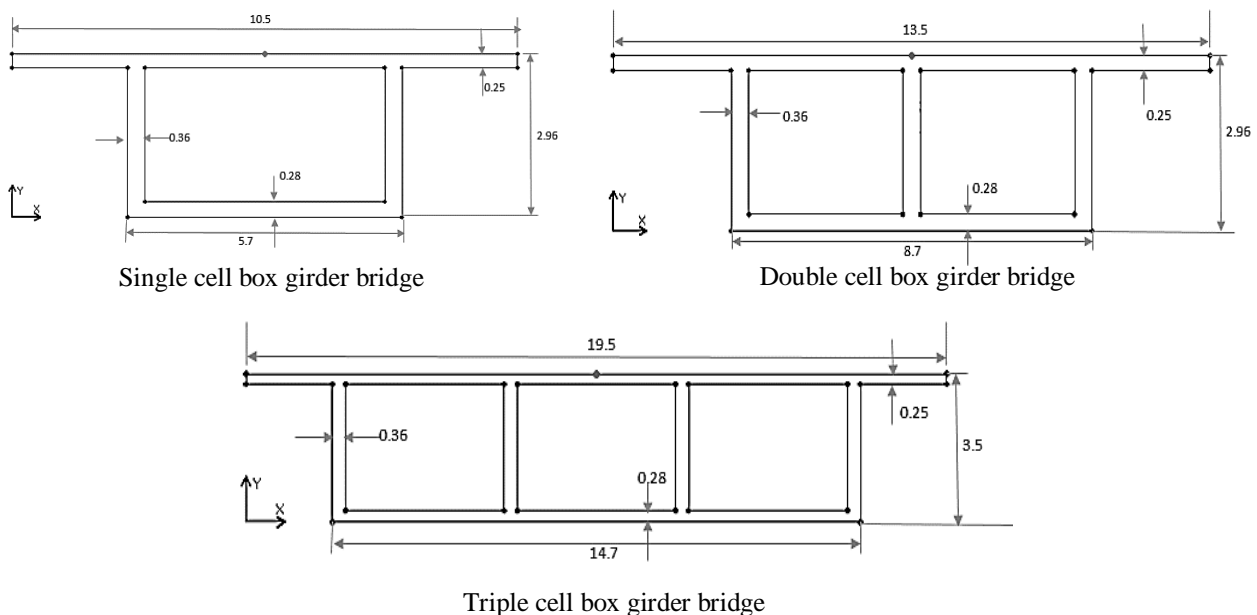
Cross sections of all three bridge models (all dimensions are in meters)
